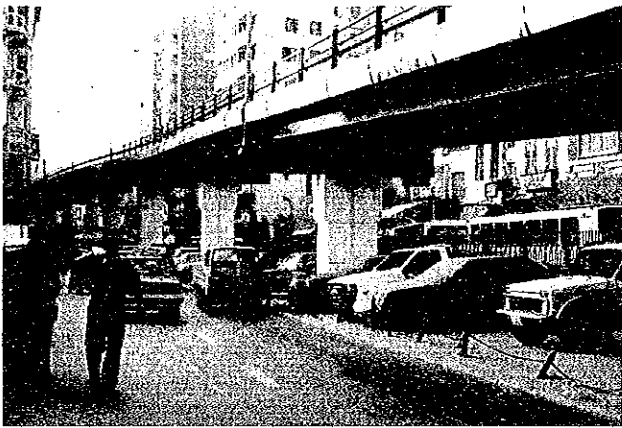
Elevated bridge in Cairo (piers are steel and fixed at the top)
